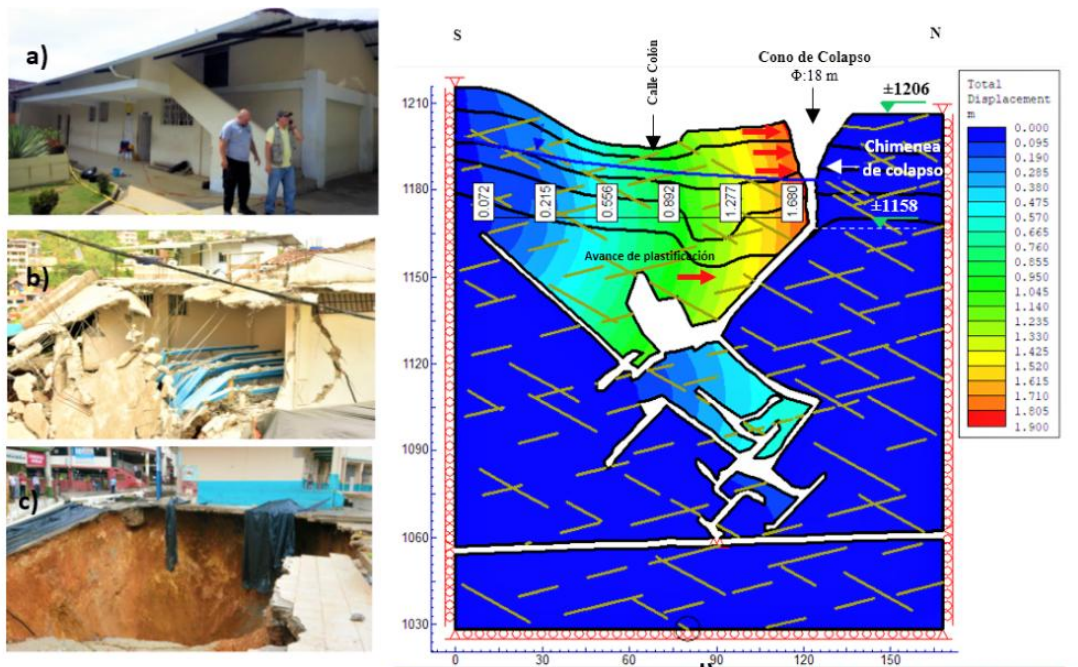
a) Classroom of La Inmaculada school (Oct-2016). b) Classroom collapse. c) Cone (Φ: 18 m) and chimney (L: 34m). d) Tensile-deformational model where deformation develops parallel to collapse chimney walls reaching displacements up to 1.90 m.
